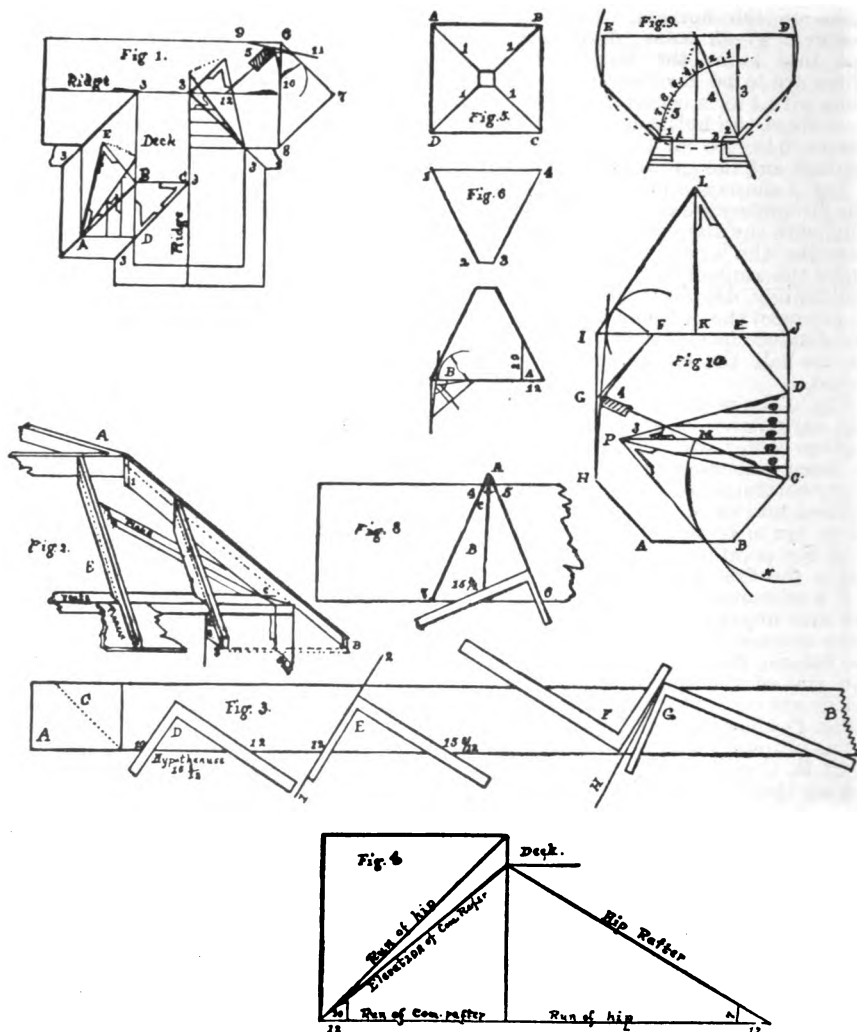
shows the plan of a nave and transept roof with hip, valleys and gables.
